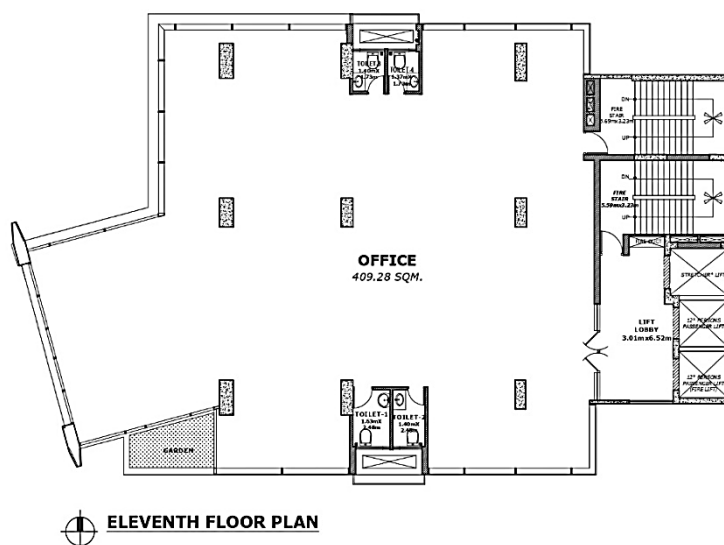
11th floor plan of south breeze square (Source: ARC Architectural Consultants)
